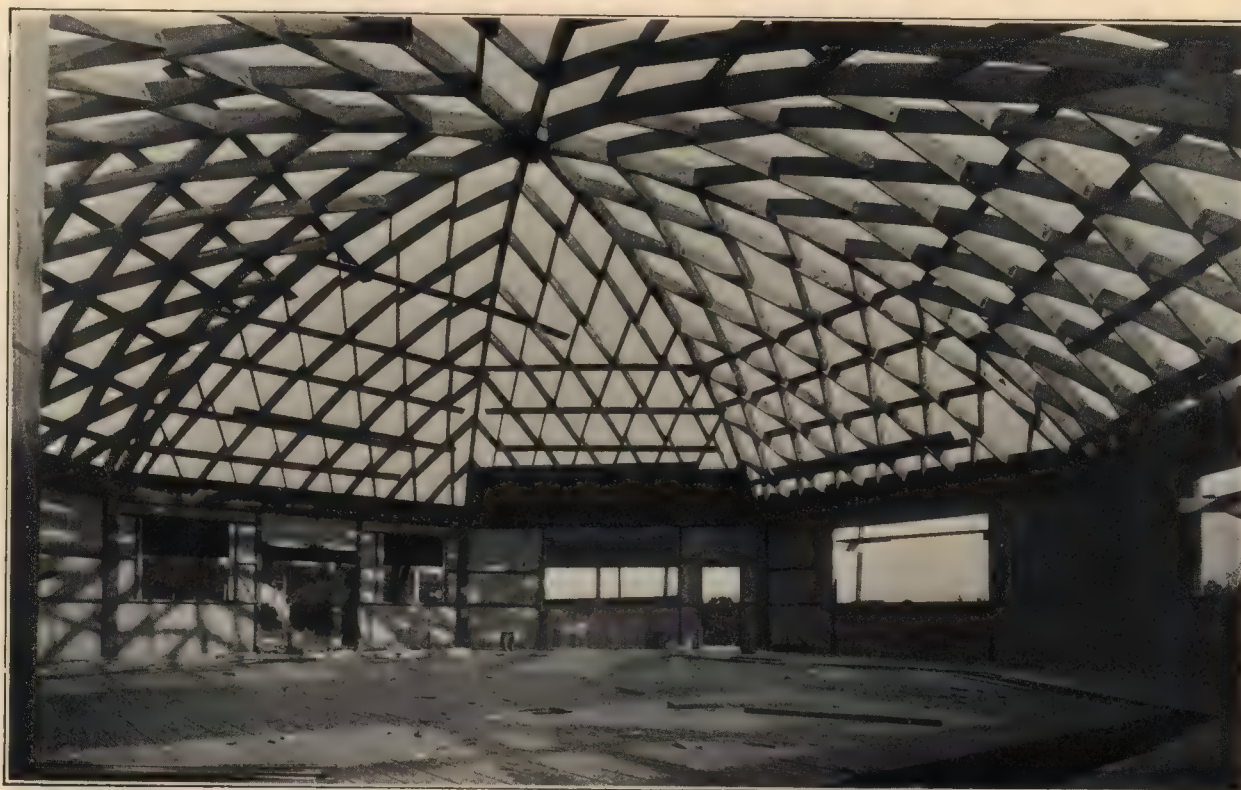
Dance hall, Shrewsbury, Mass. The plan of this building is an octagon.
